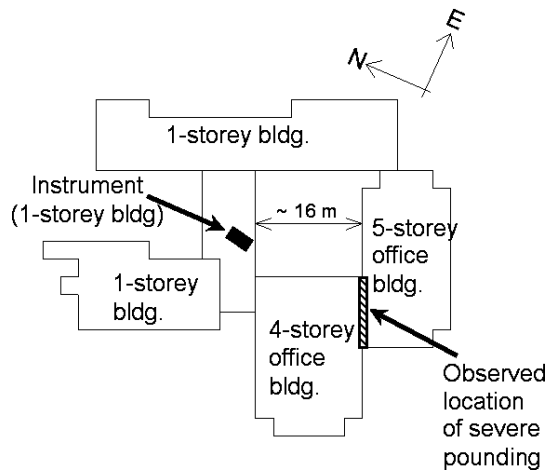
Bingöl Public Works and Settlement branch office complex, which includes the 5-storey reinforced concrete main office building connected to a 4-storey office building with a 1-storey building containing the accelerometer sensor approximately 16 m from the 4- and 5-storey buildings. The two mid-rise buildings experienced pounding in the NS direction during the main event.
